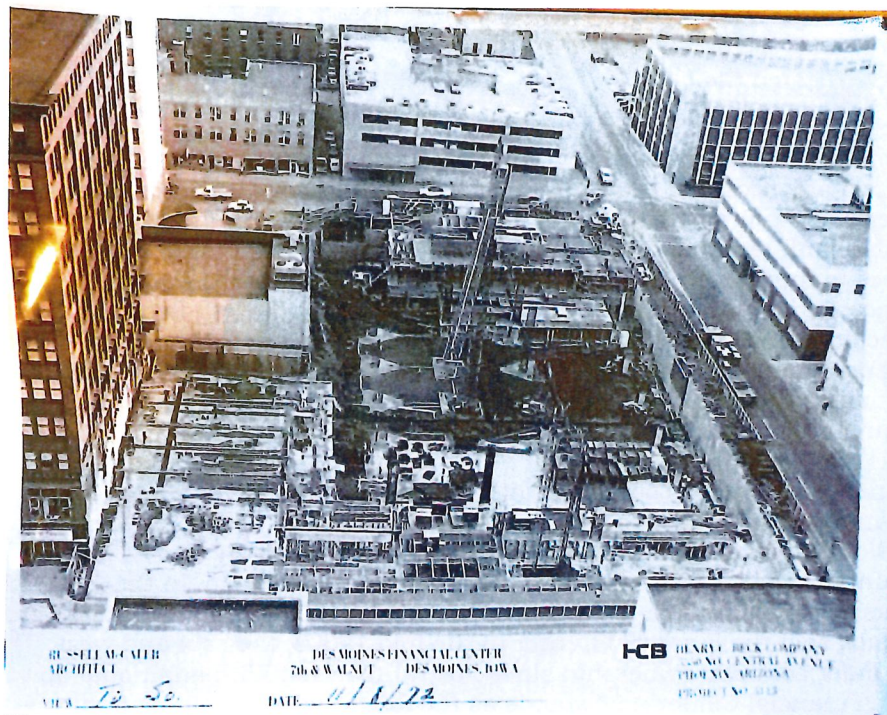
Figure: November 1972 progress photograph shows the construction status of the underground parking ramp, view looking south from across Walnut Street. Taken by Henry C. Beck Co. (Financial Center files)
